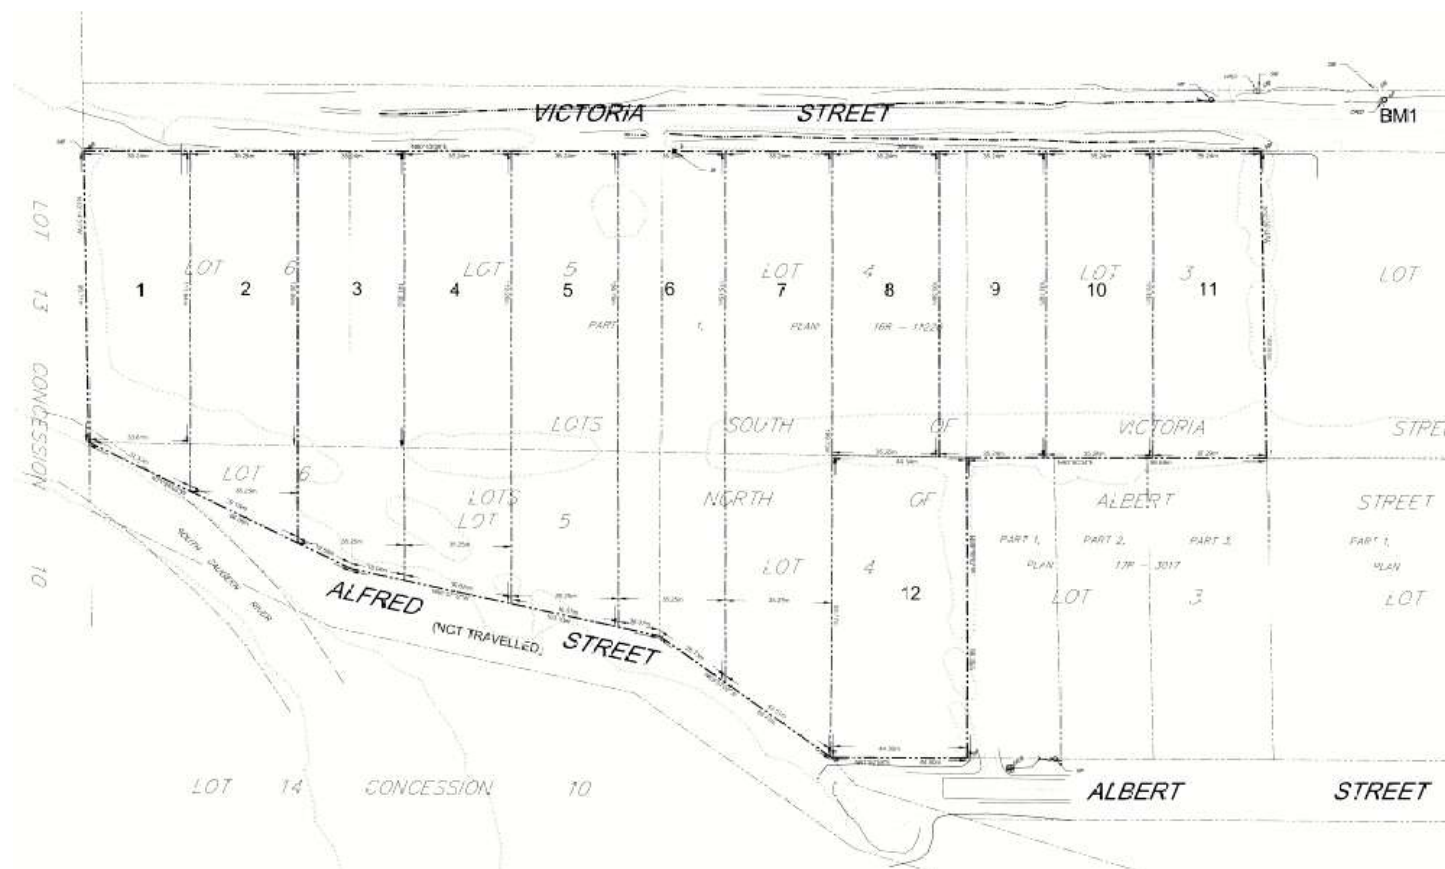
Draft Plan of Subdivision layout (Cobide Engineering)
